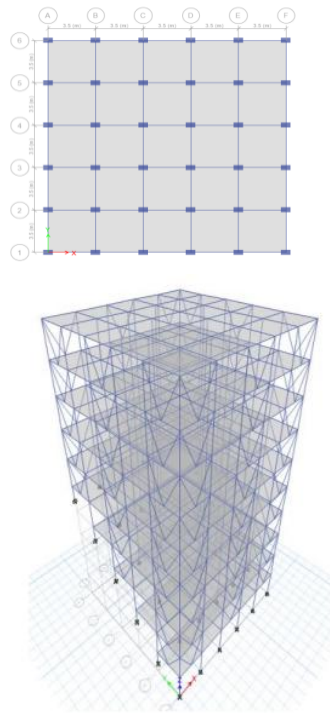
Plan and 3D Model of Sloped Building with V Bracing
